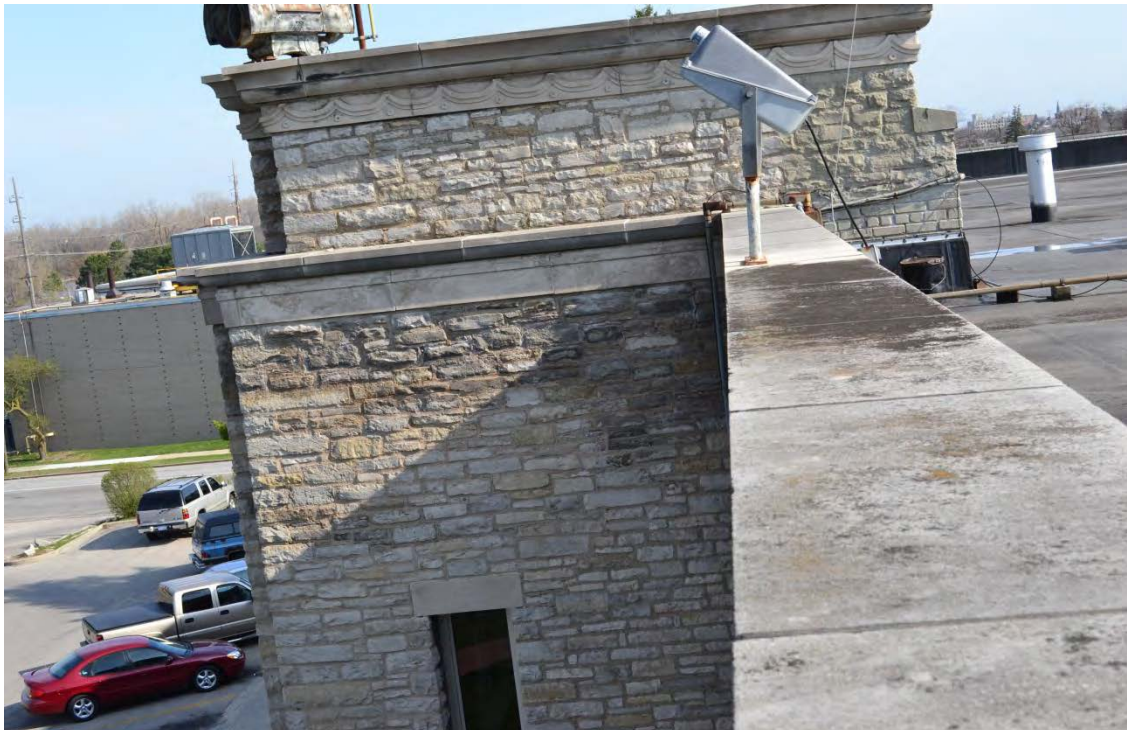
Looking north at south side of parapet B on west side of building. Parapet A in foreground.
